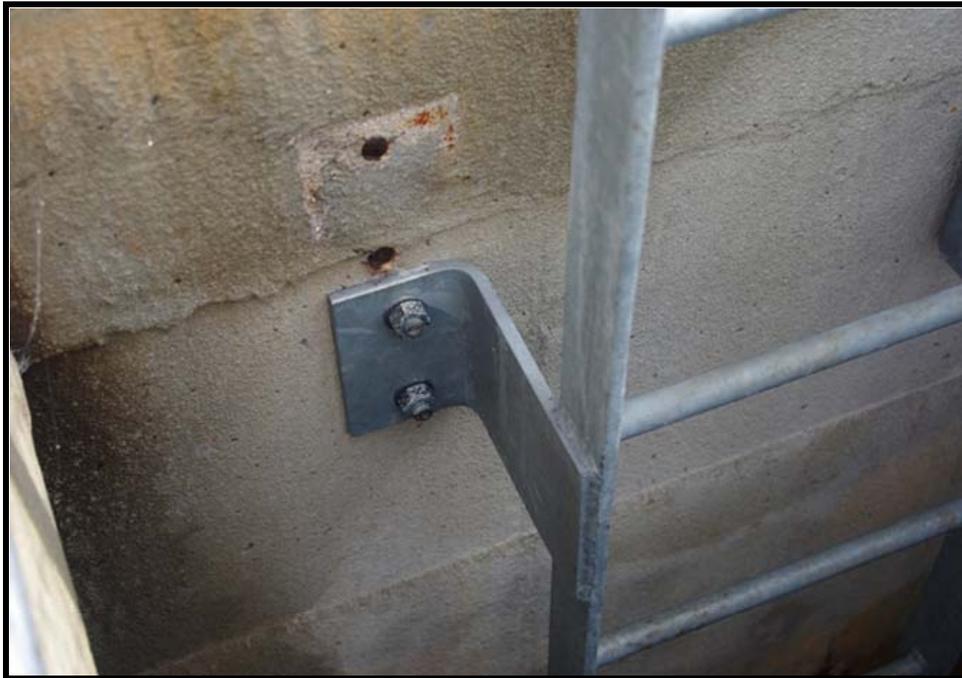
Interior ladder and bracket. Note apparent location of previous ladder bracket.
